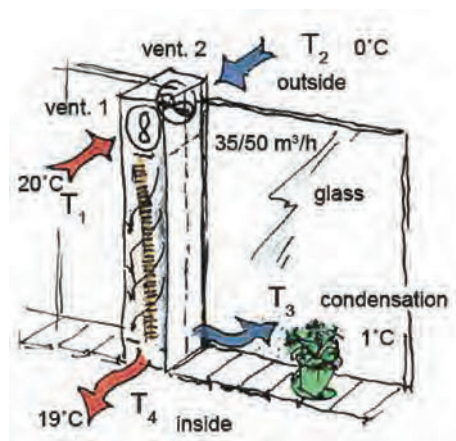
The Breathing Window can be a jamb, mullion or built in a wall (above); the first generation prototype design (right)
